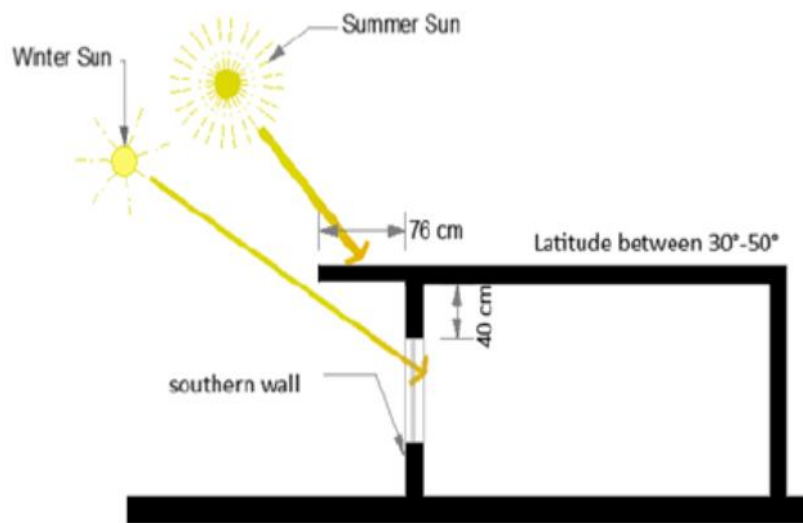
Roof overhang for south façade shading (Source: Donald Watson, 1983).
